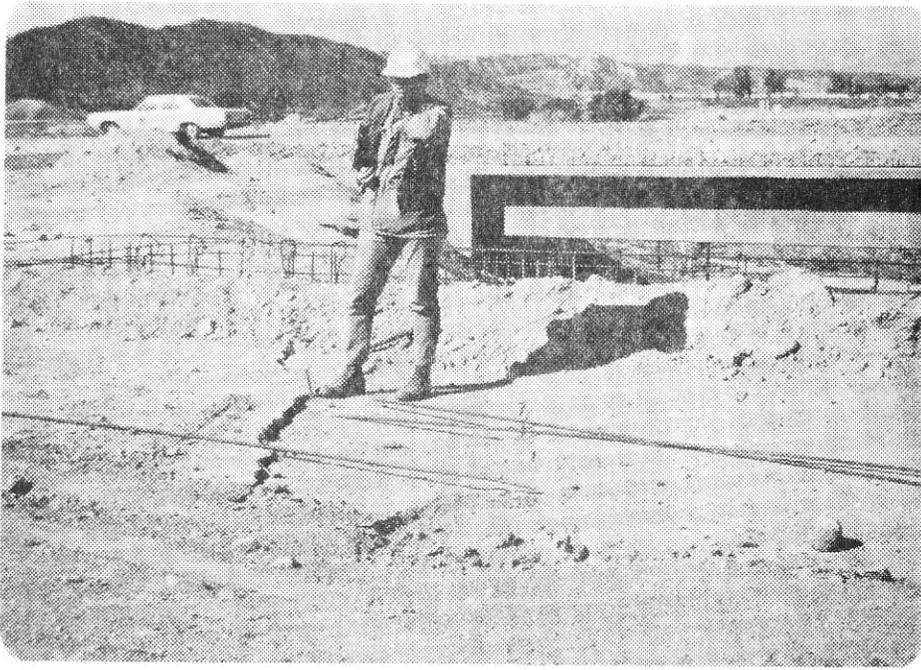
Abutment backfill settlement at the Santa Clara River Bridge (west abutment, east-bound structure).
